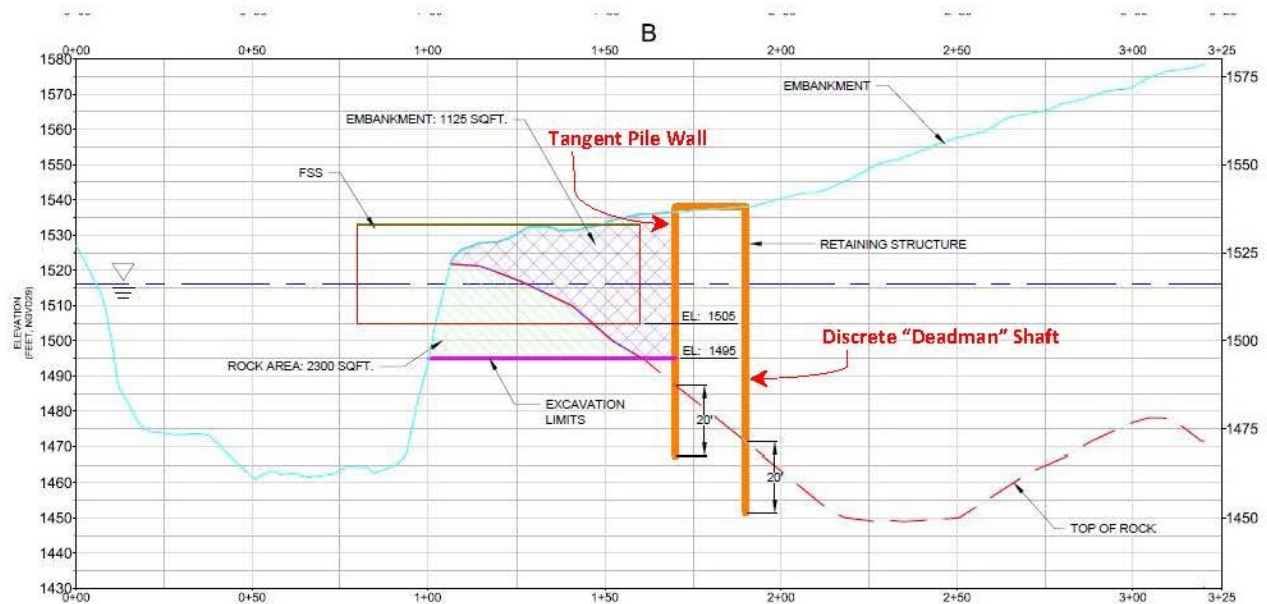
Conceptual Cross Section of Retaining Structure Showing Tangent Pile Wall Connected to Discrete Shafts
